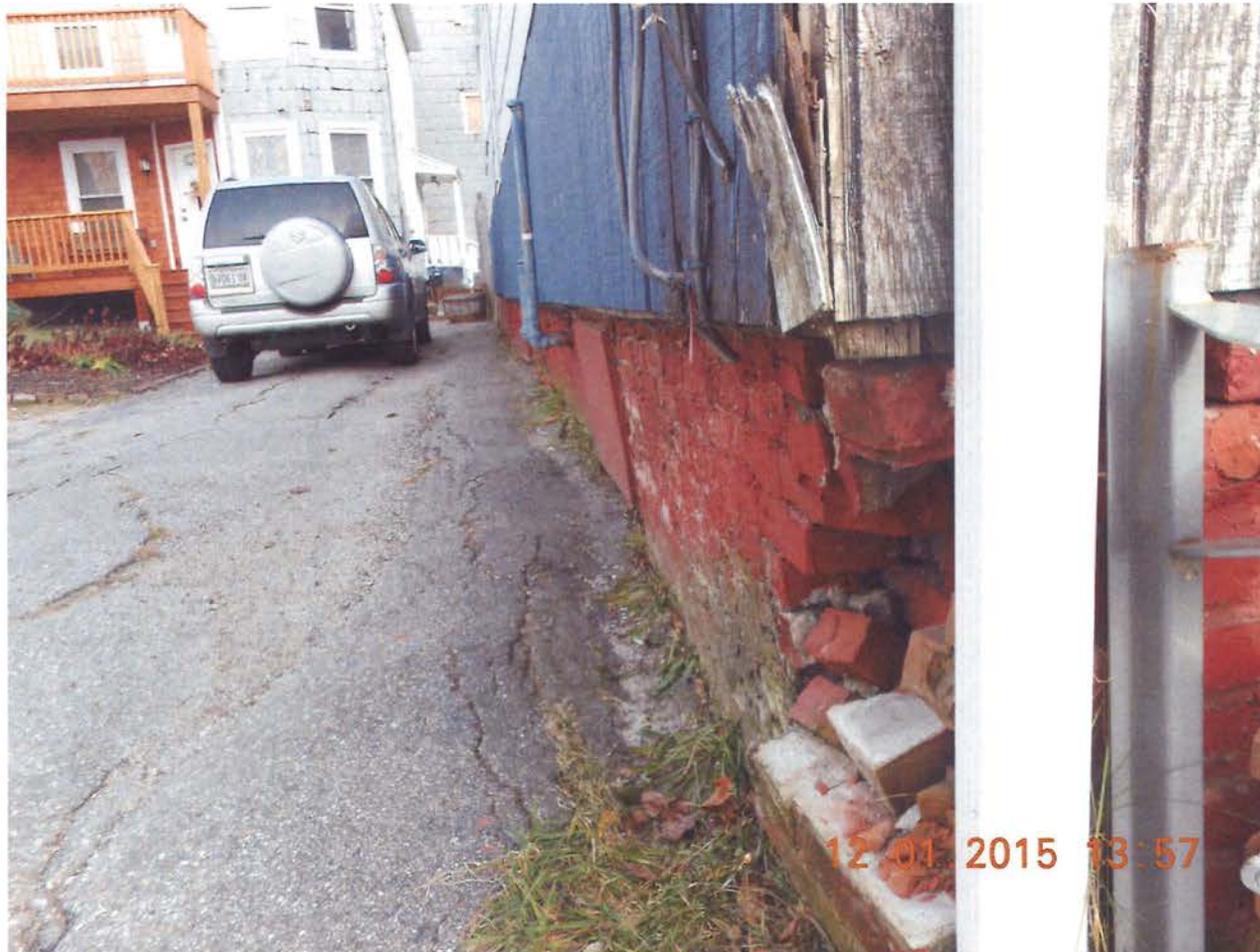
shows another view of the collapsing masonry foundation and the depression of asphalt.
